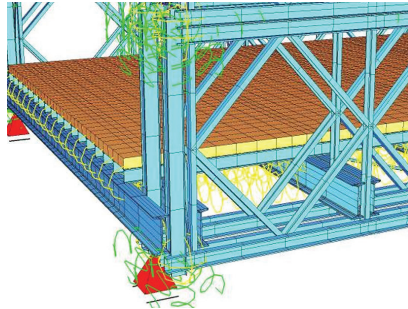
Support detail – Bailey girder segment with support post and 3D FEM visualization
